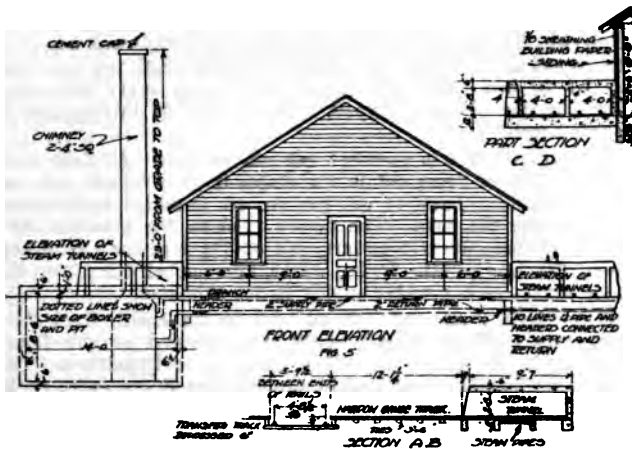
ELEVATION AND SECTION VIEWS, PLANT NO. 9
